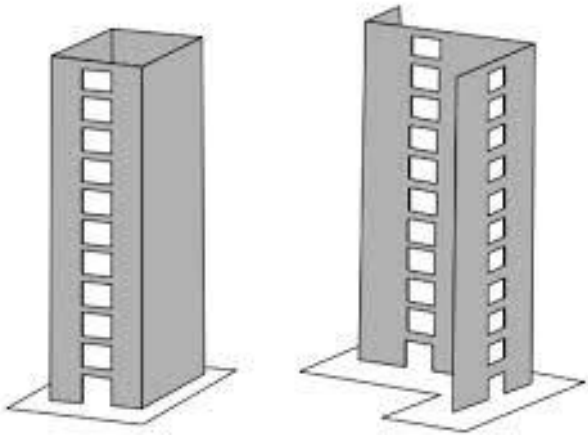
Concrete Shear Wall Configurations<sup>2</sup>
